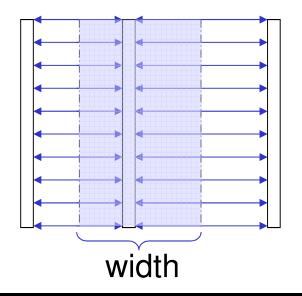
, 1.1b Structural loading diagram of an architectural condition
